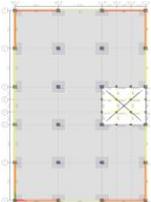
Model 3: Flat slab structure with shear wall provided corner portion
